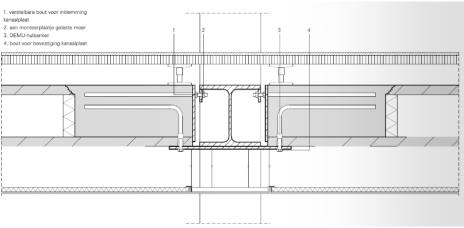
Connection HCS-girder temporary courthouse Amsterdam [17]
